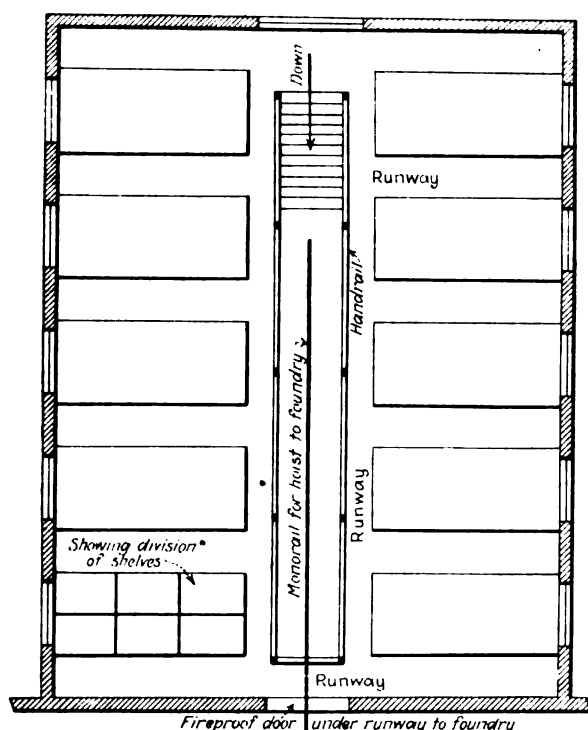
PLAN OF PATTERN STORAGE ROOM
